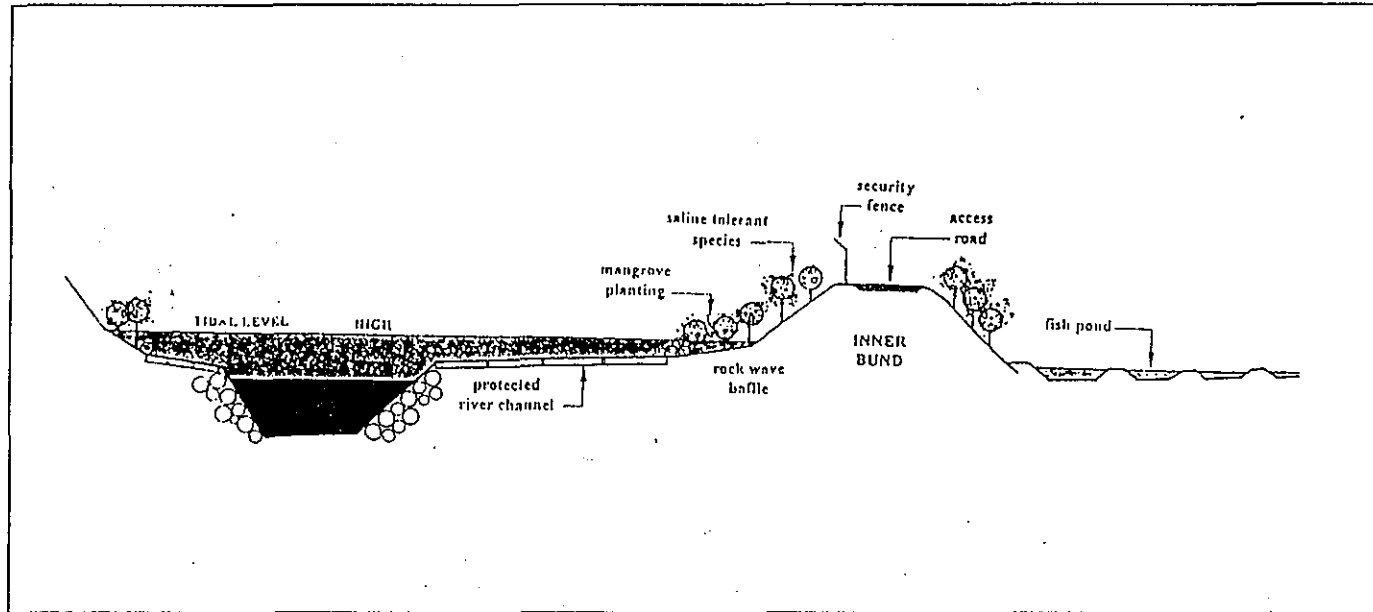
Cross-section of south bank of Shenzhen River after completion of Stage 2 Works showing mangrove planting theme
